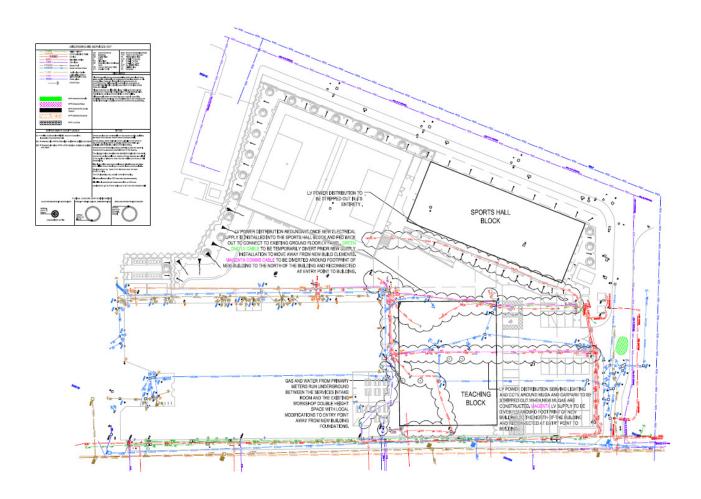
Proposed Site Layout Overlaid Above Existing Buried Services
